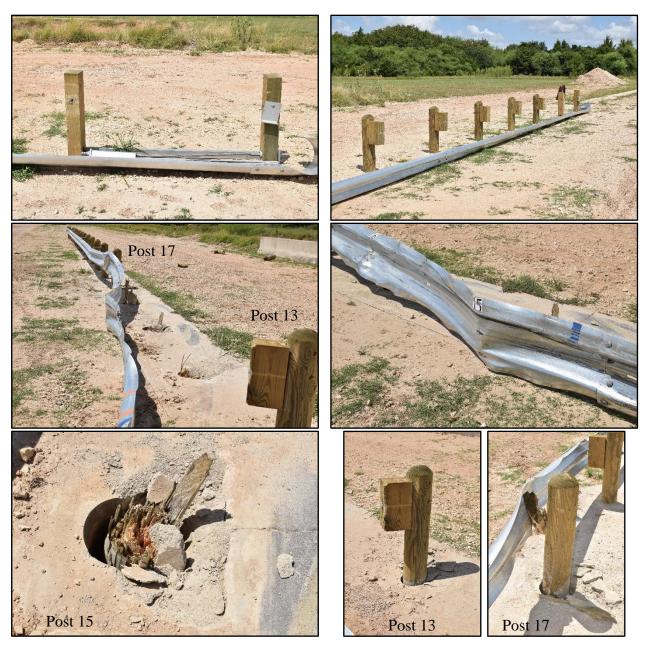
Damage to Installation after Test No. 469689-4-1.
